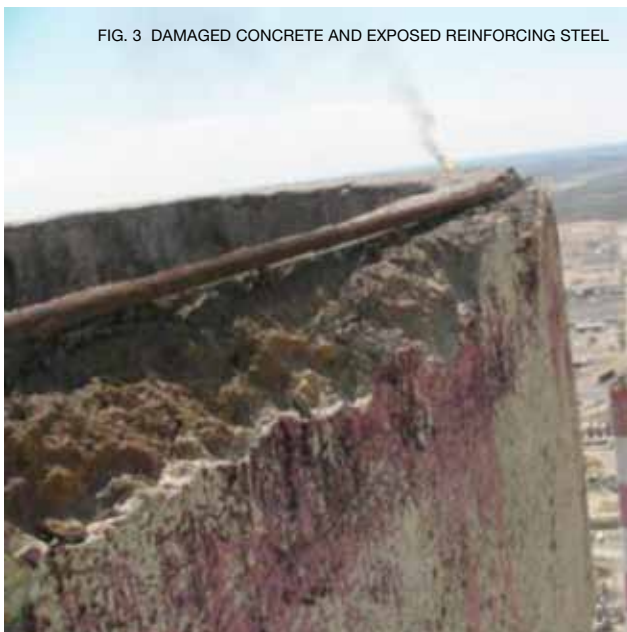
DAMAGED CONCRETE AND EXPOSED REINFORCING STEEL
